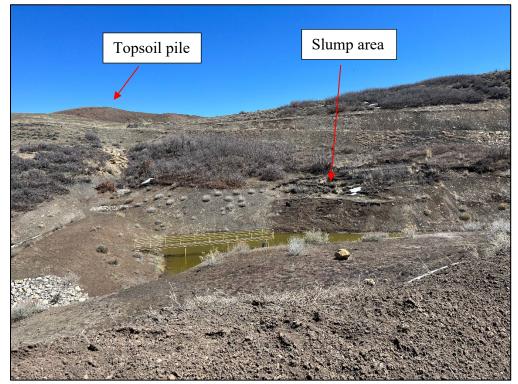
Section 26 Pond, slump to the east continues to be monitored.
